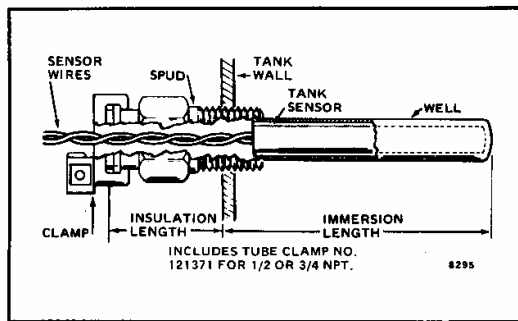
TANK SENSOR INSERTED IN IMMERSION WELL.
